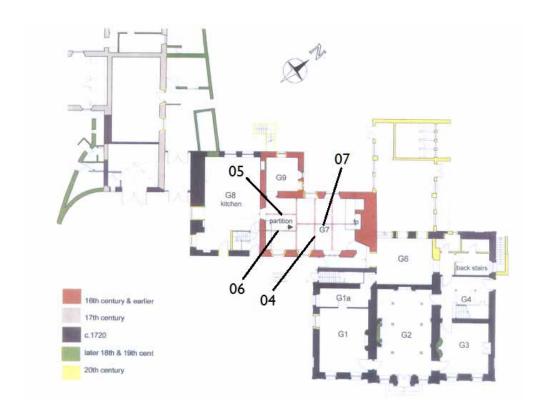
Ground-floor plan of Sherborne House, showing the 'Tudor Wing' outlined in red (rooms G7 and G9), and the timbers sampled for dendrochronology. Adapted from an original drawing in Rodwell (2009)
